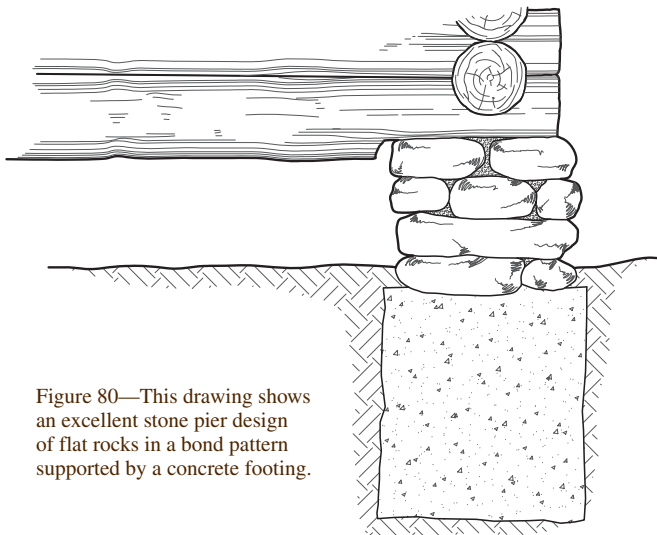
This drawing shows an excellent stone pier design of flat rocks in a bond pattern supported by a concrete footing.
